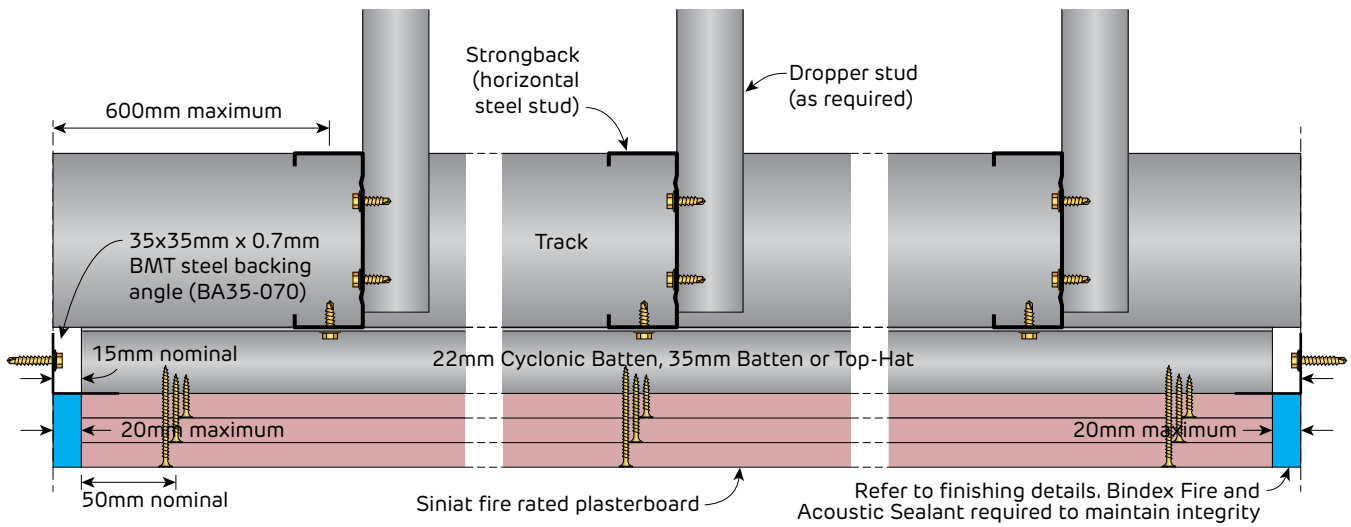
Stud Ceiling Type C2 - Batten End Detail
